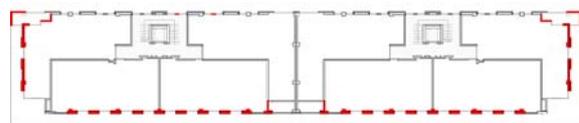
Cerdanyola residential building, typical floor plan. In red, solar wall façades.
